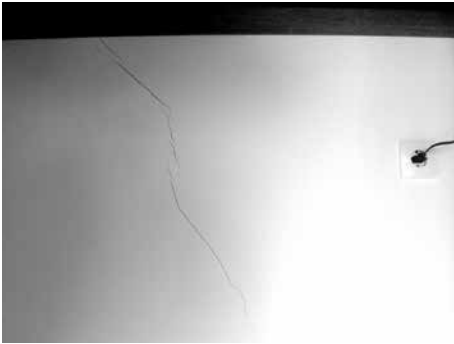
Repair strategies of cracked walls – sample cases discussed VII, VIII, IX.
